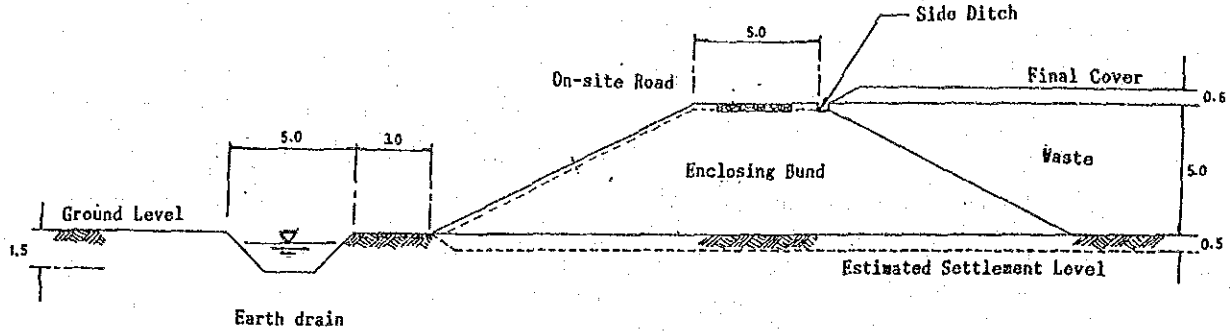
Typical Cross Section of Surrounding Drain
